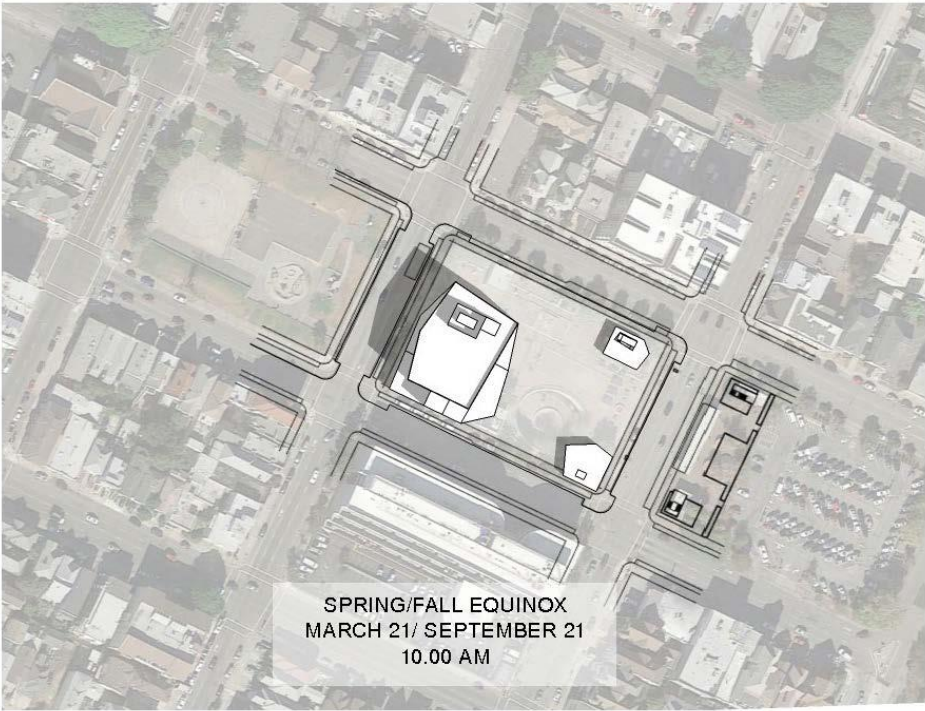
Shadows cast by the proposed TOF building on spring/fall equinox at 10 a.m.
